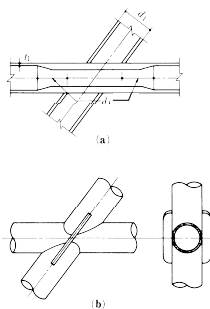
Reinforcement at the Bracing Joint (Steel pipe)
